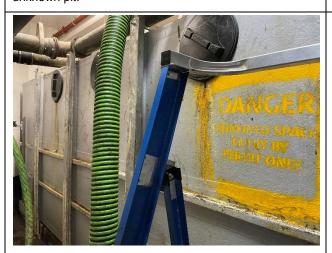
Level B2, Grease Arrestor Room, adjacent parking space 100 – grease trap.
